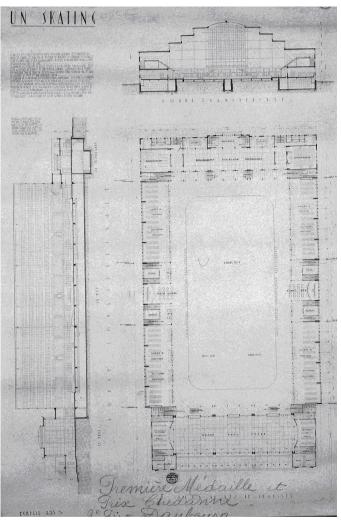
Ventre, "concours de construction générale" 1934: a skating rink in a sports training and advertising center. Plan, cross and longitudinal section (BENSBA, CG - not catalogued)
